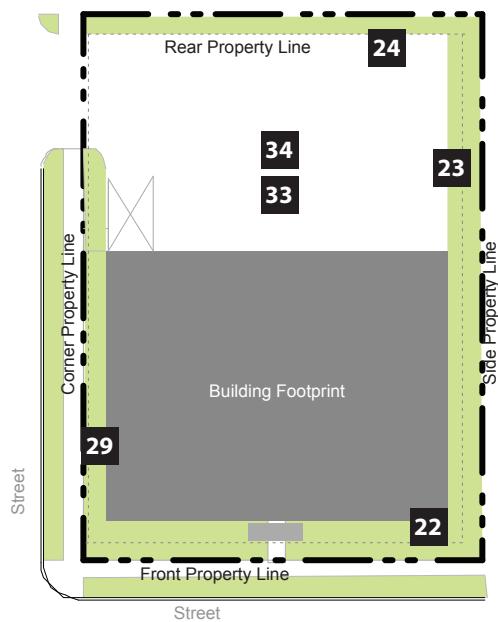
Civic building siting diagram shown with side vehicular access and tower at entry. Not to scale.
